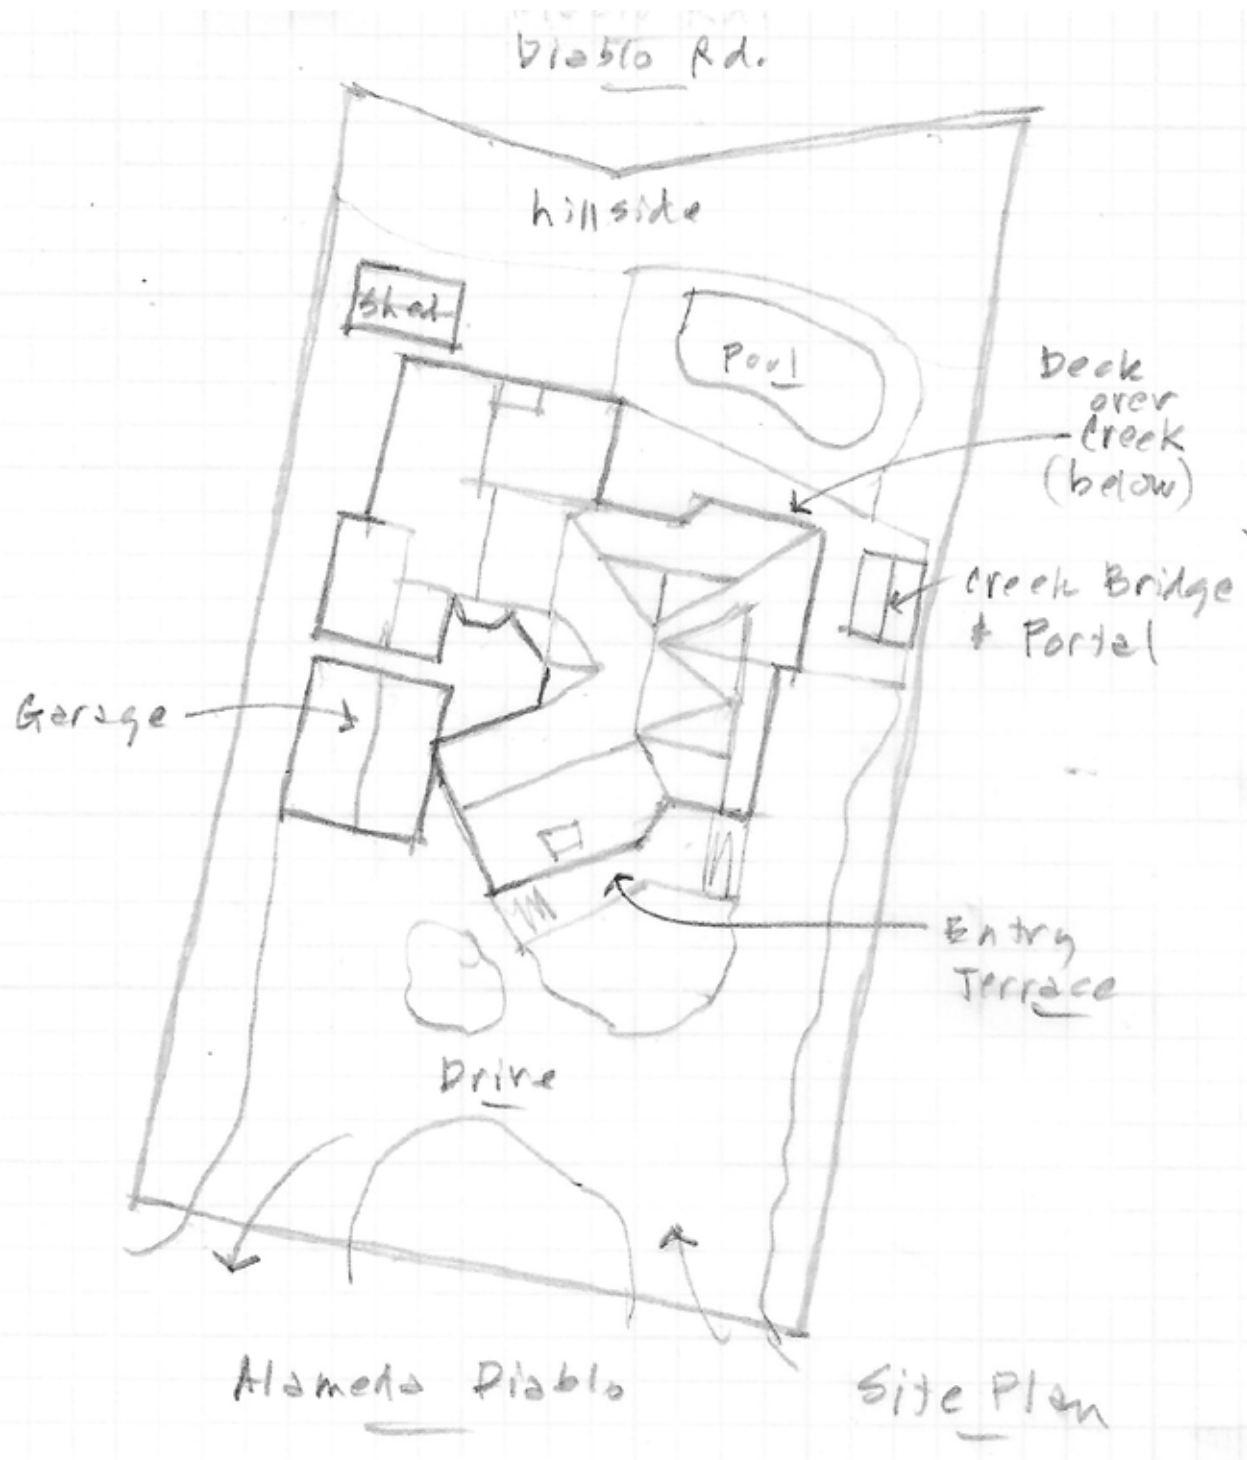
1850 Alameda Diablo – Site plan (note: south is up)
